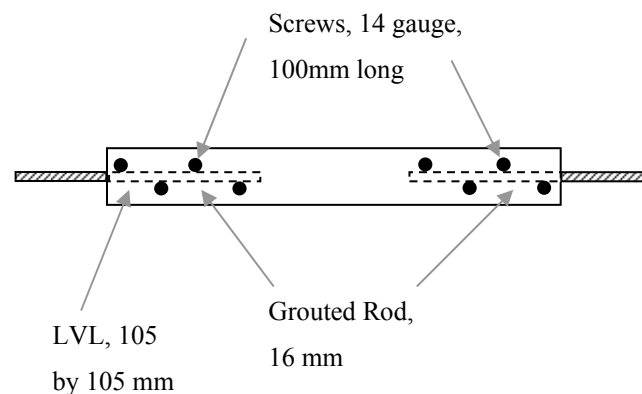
Configuration of HY 150 specimen with screws in adhesive
